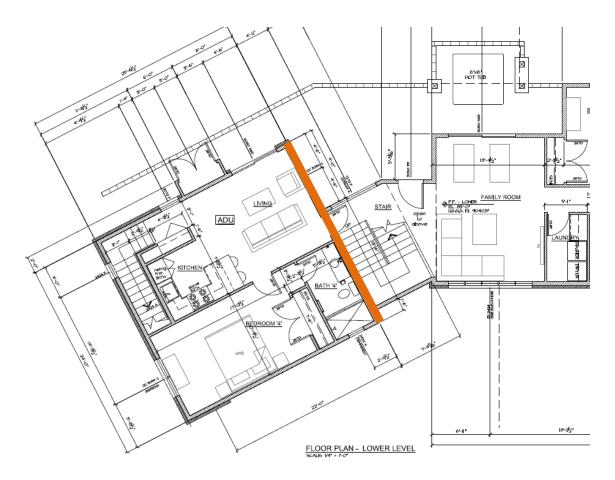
Lower Level Floor Plan. Shared wall between ADU and primary structure shown in orange.
